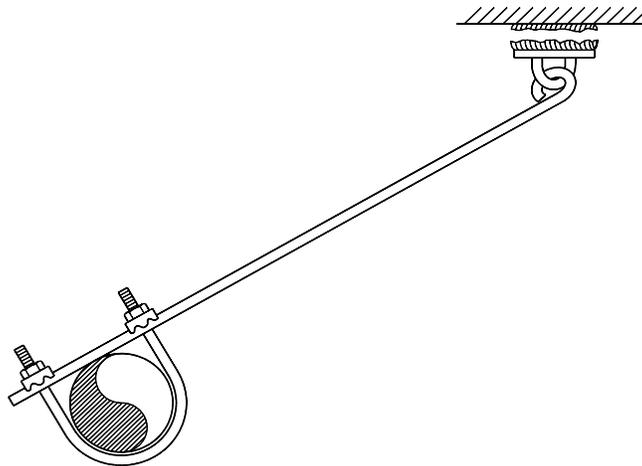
Undersize Weld May Shear
